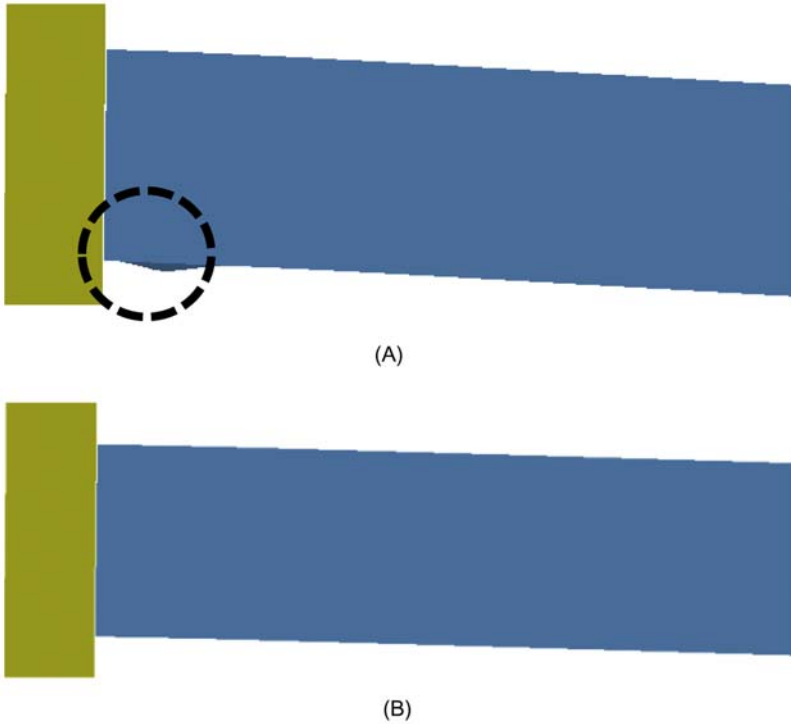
Failure mode of the CFDST specimens: (A) deformed shape of CFDST specimen with normal strength concrete filler and (B) deformed shape of CFDST specimen with UHPC filler.
